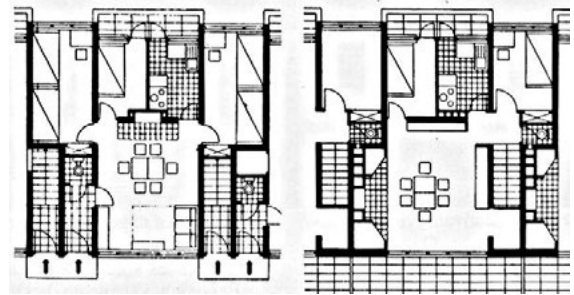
Hoek van Holland, floor plans; Source: <https://i.piniimg.com/originals...>, access: 10.10.2017
